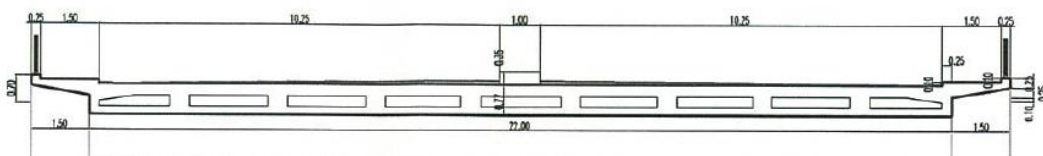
Cross section of arch slab near the hinge (section 2-2)
